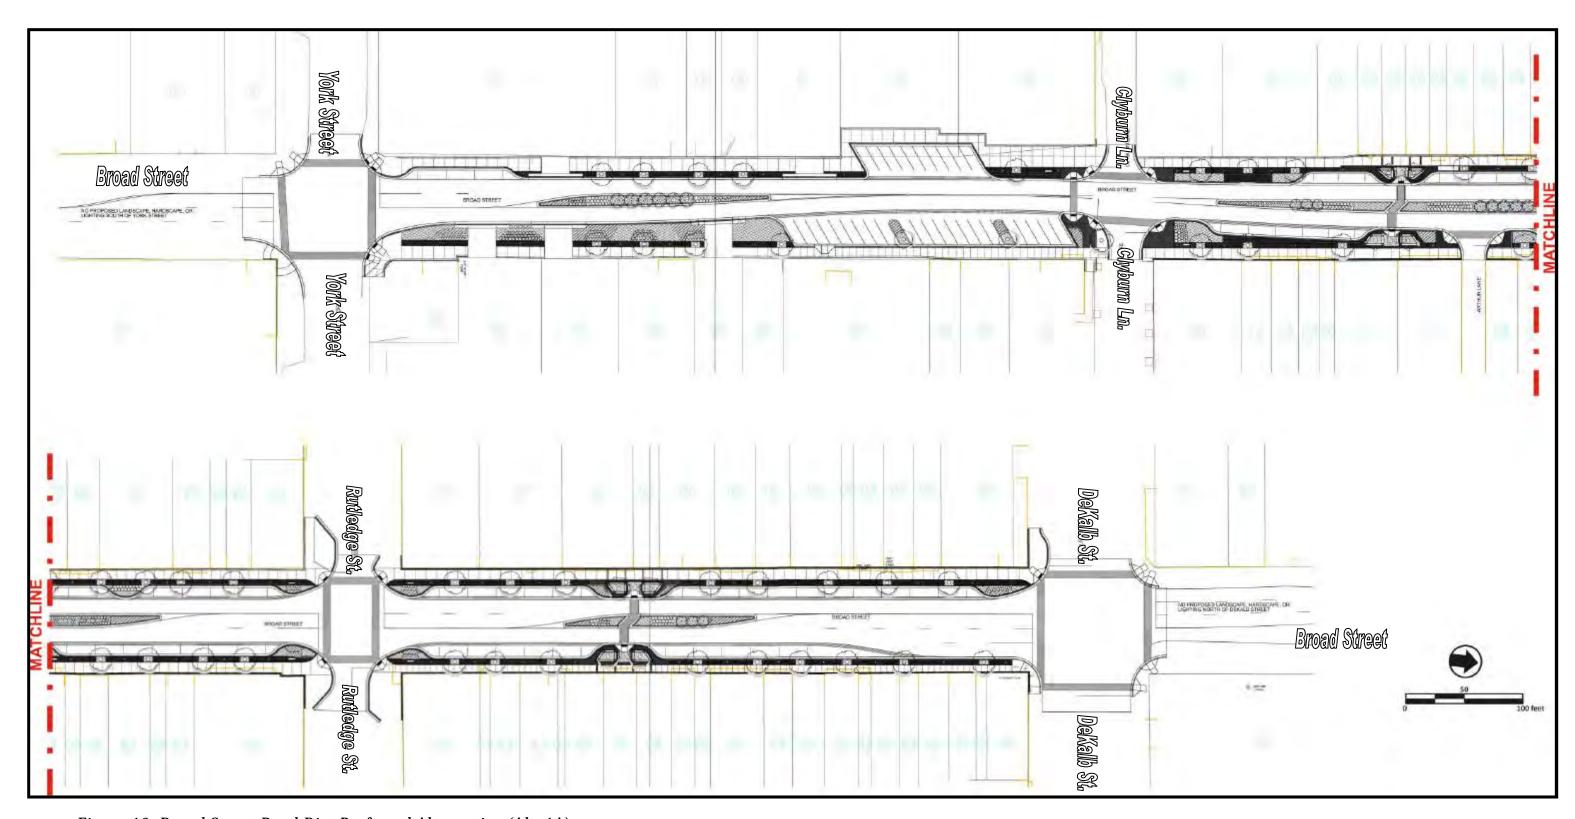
Broad Street Road Diet Preferred Alternative (Alt. 1A)
